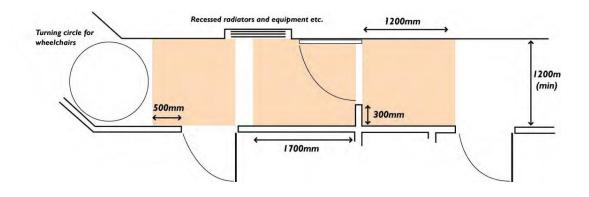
6: Minimum working dimensions for wheelchair users in walkways
